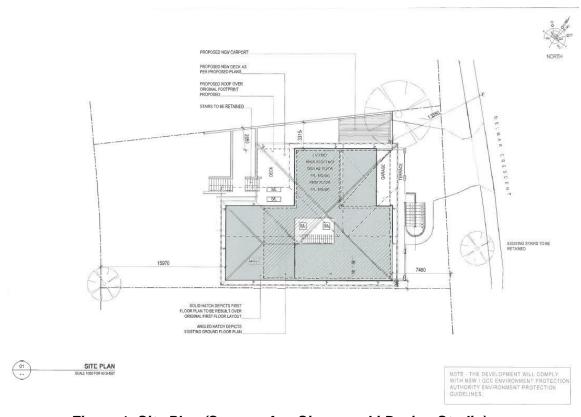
Site Plan (Source: Ace Simonovski Design Studio)
